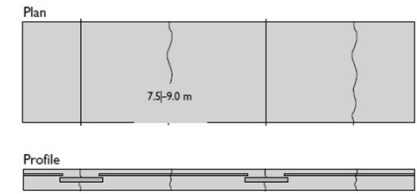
Jointed reinforced concrete pavement (JRCP) (courtesy: ACPA).
